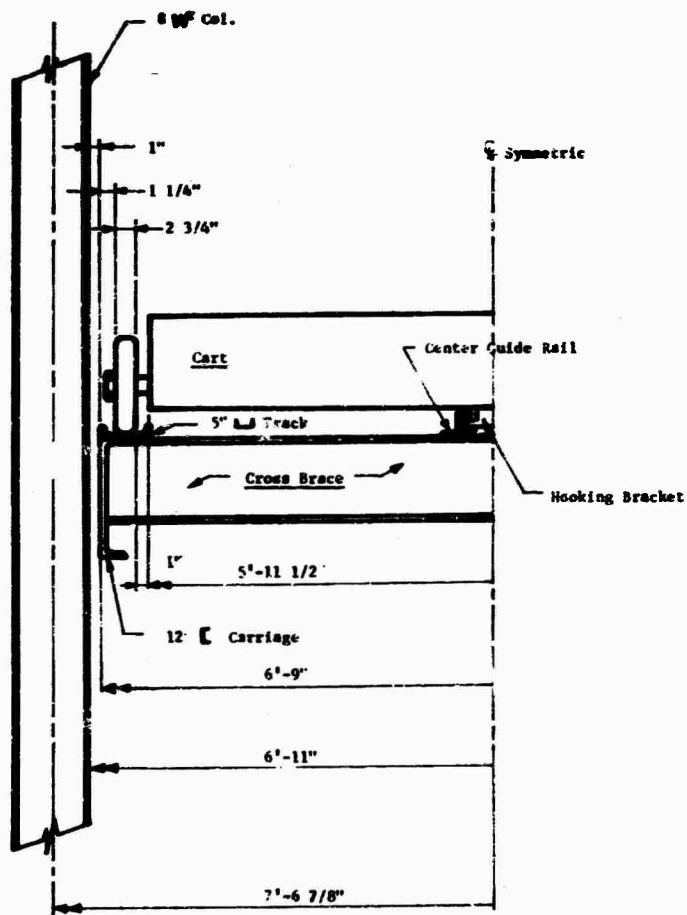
CROSS SECTIONAL VIEW OF RAMP
